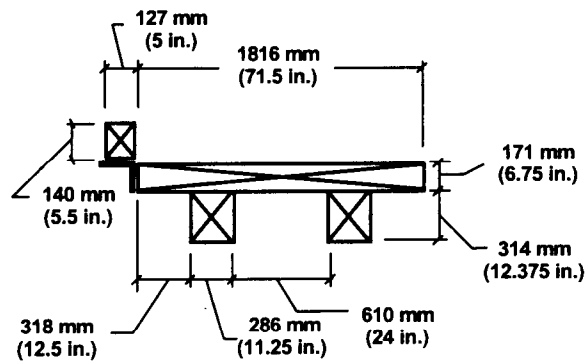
Cross section view of the longitudinal T-section glulam deck panels with the curb rail attached. Diaphragms and connectors are omitted for clarity.
